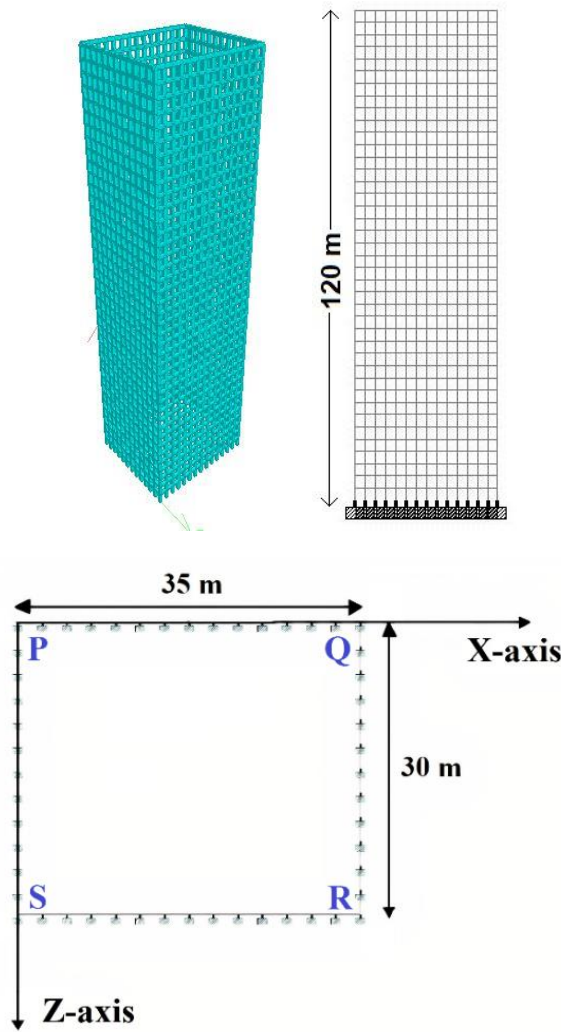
Plan,Elevation and Isometric view of STAAD-pro building model.
